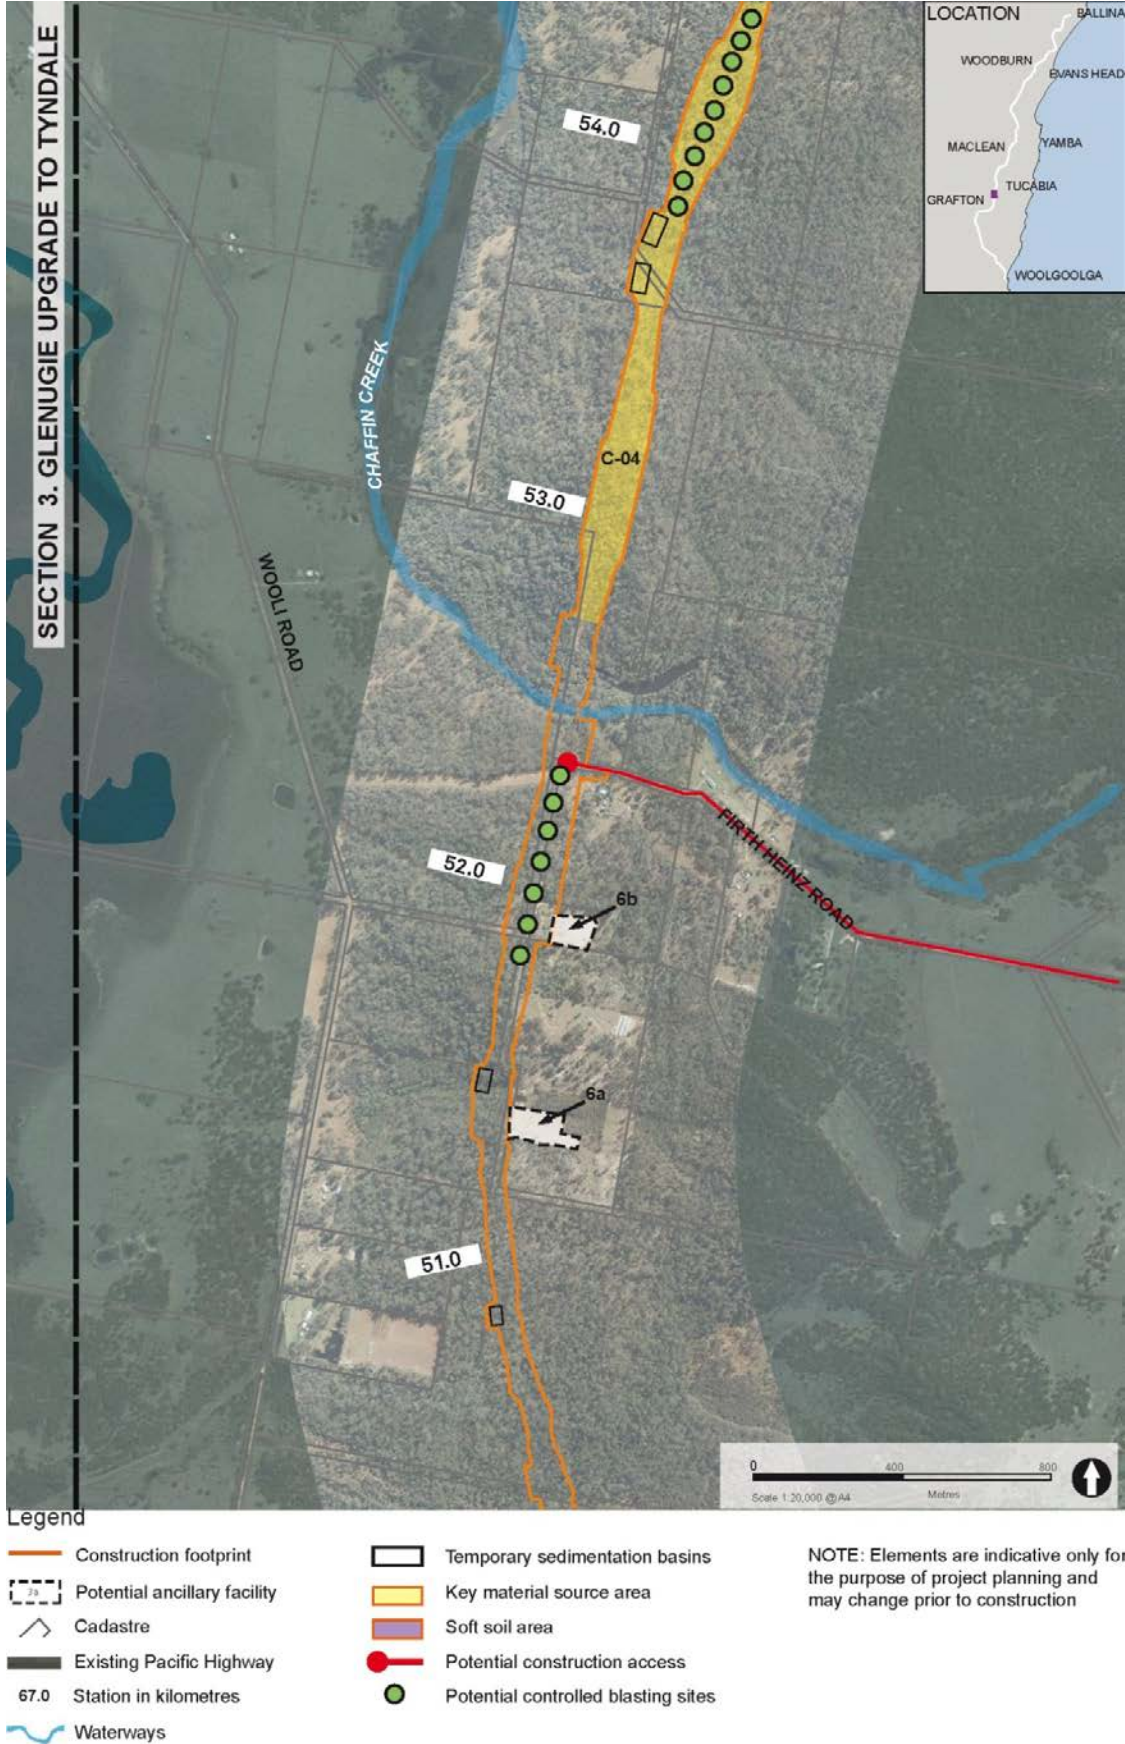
Extent of construction and construction features Section 3 (Station 50.6 to 54.3)
